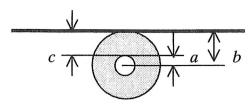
Idealization of the concrete around the reinforcement by a thick-walled cylinder.
